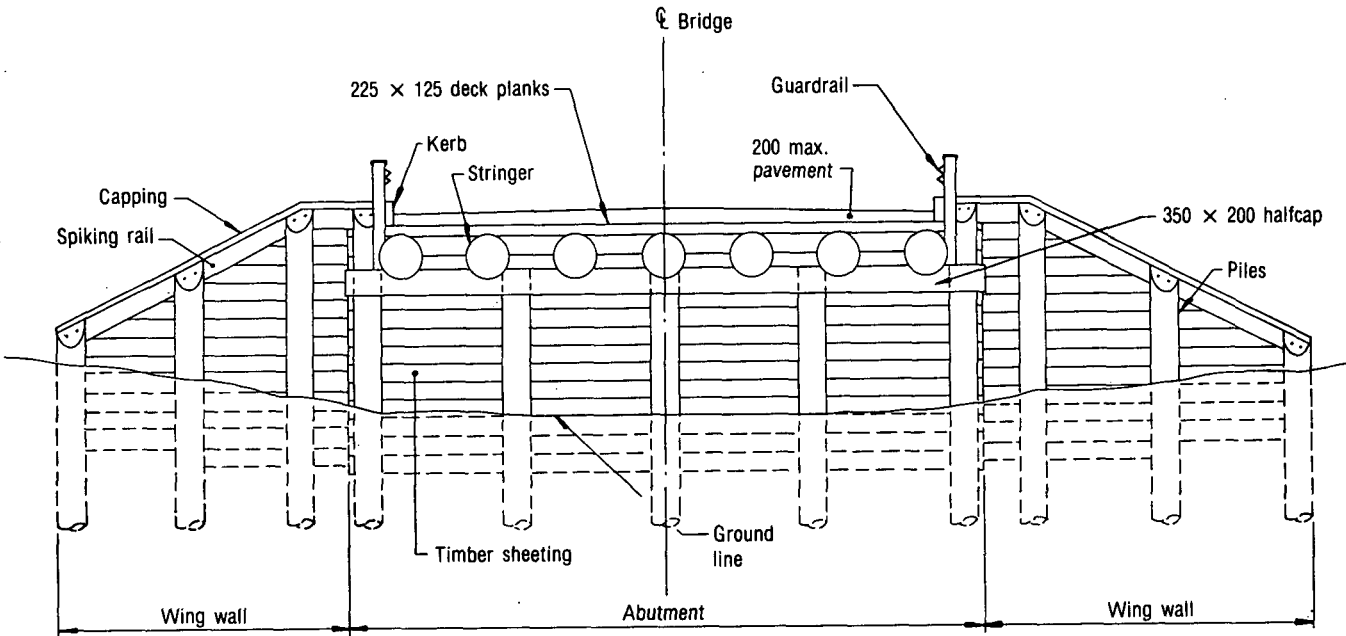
ELEVATION OF BRIDGE ABUTMENT
